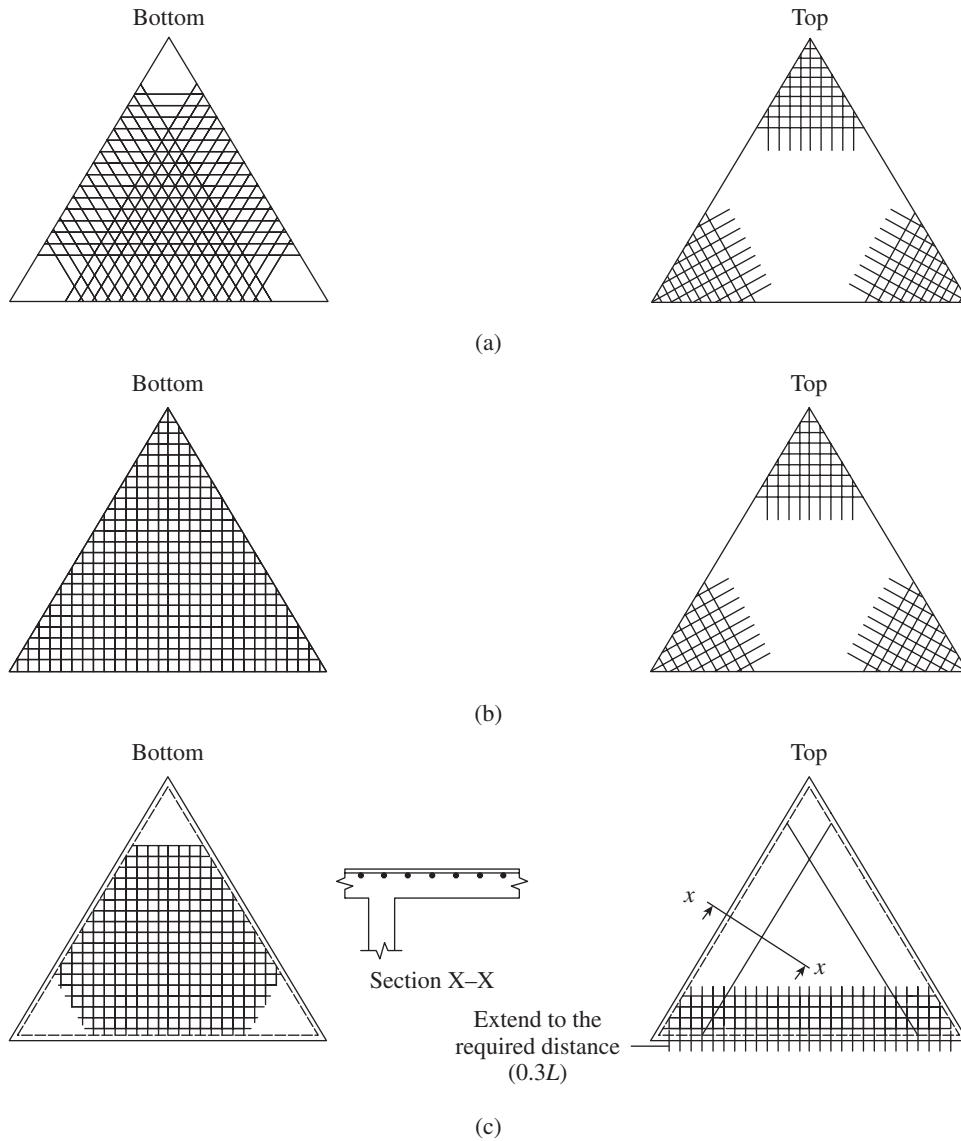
Detailing of reinforcement in triangular slabs (a) Simply supported slab (b) Simply supported slab—alternate detailing (c) Fixed slab
